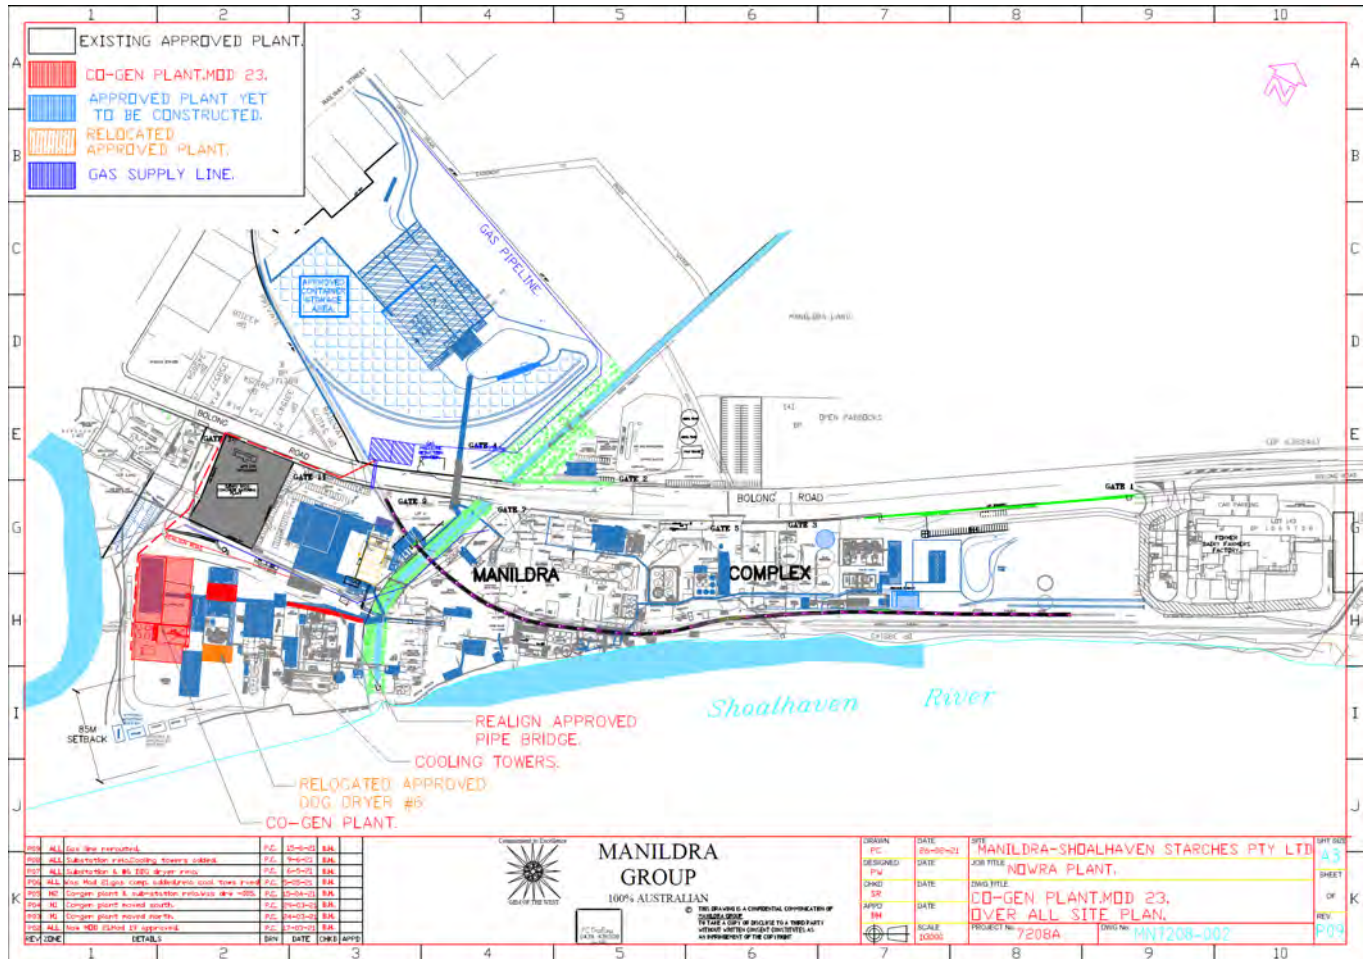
Shoalhaven Starches Overall Site Plan, Co-Gen Plant Mod 23 Proposal (Manildra Group Ref: Project 7208A, DWG No. MN7208-002 rev. P09)
